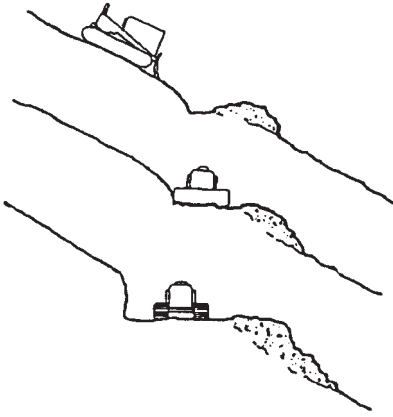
Creating initial access/benches (Nichols, 1956).
